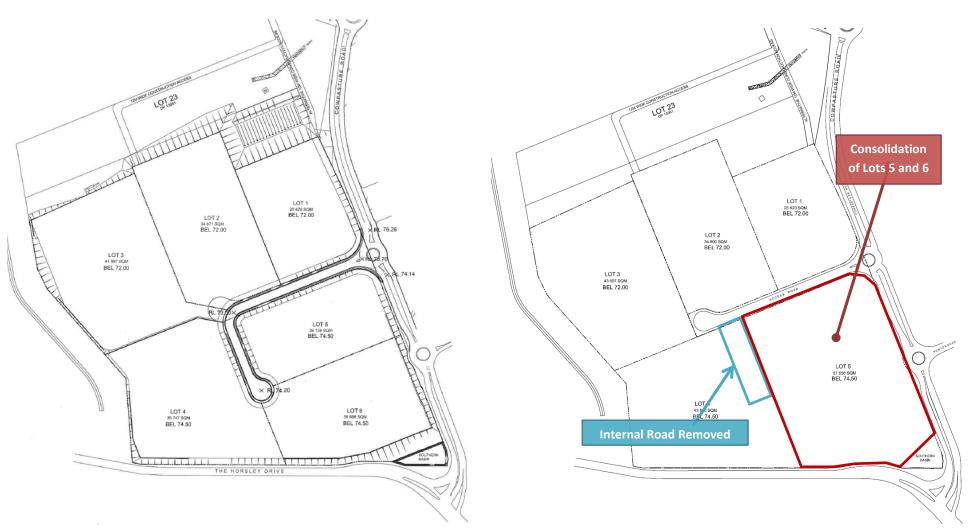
Comparison of Approved and Proposed Subdivision Layout (approved left, proposed right)
